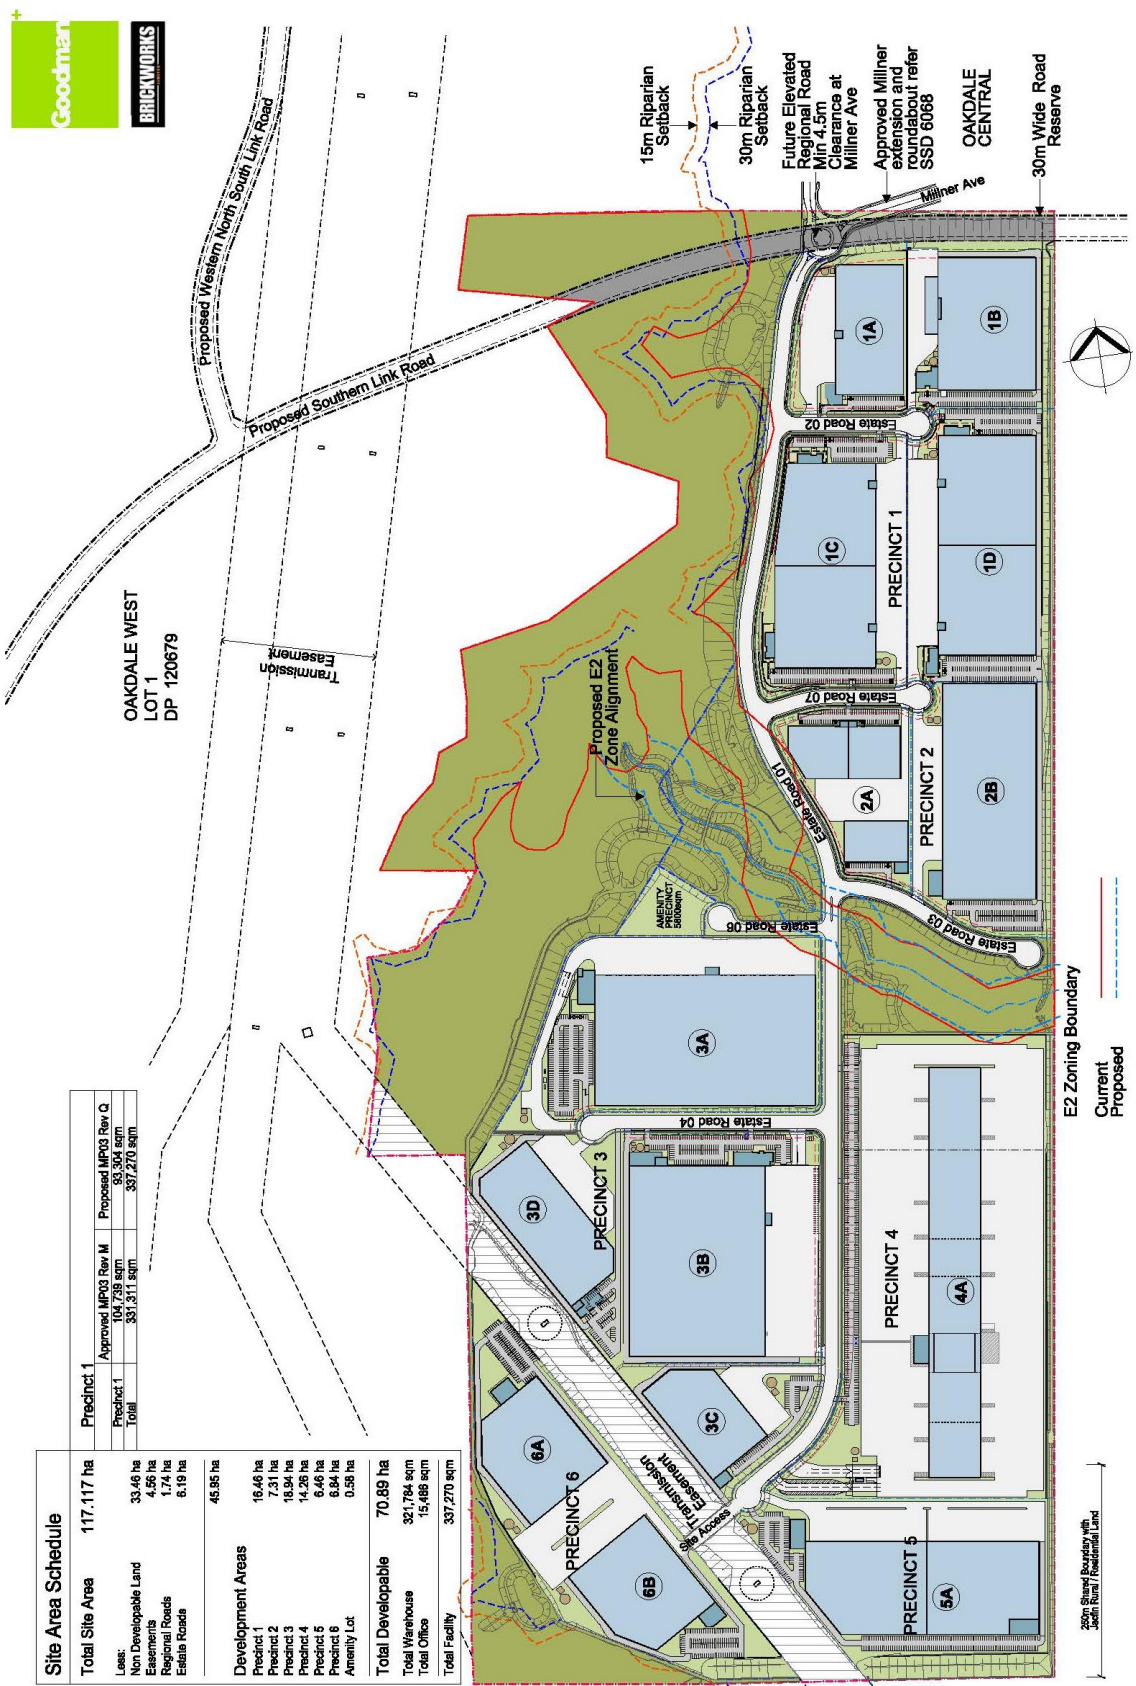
Proposed Masterplan Layout (Subject to MOD 4 Approval)
